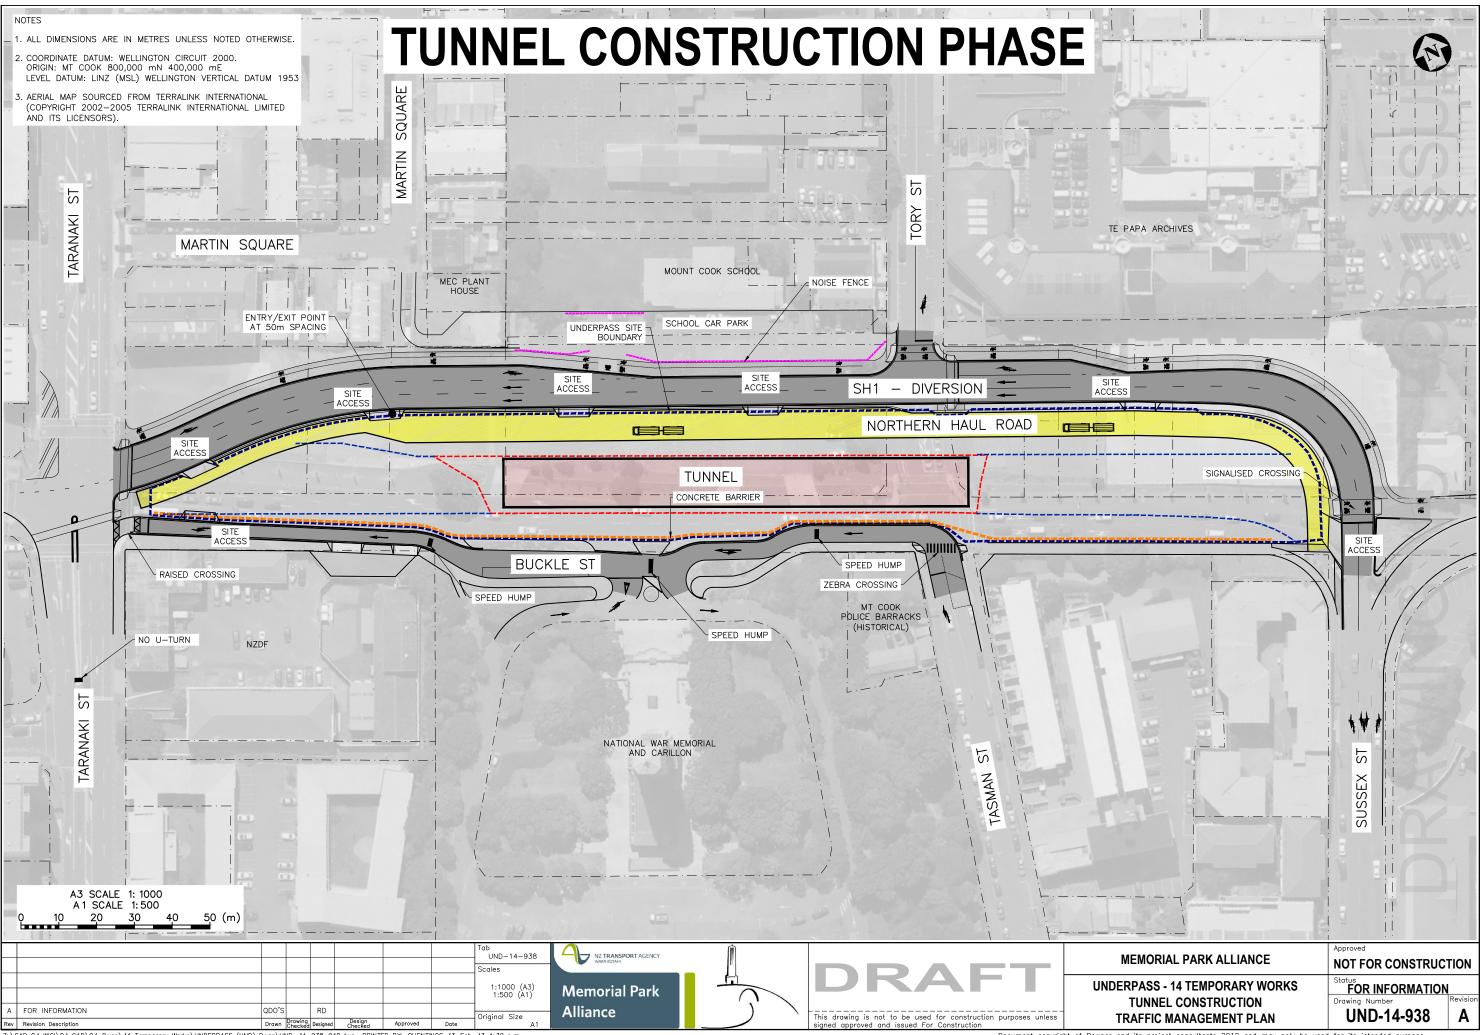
to 940 shows the indicative site layout relative to the SH1 diversion road, and examples of how construction vehicles will typically access the site for various phases of construction. Construction is to start at the Taranaki Street end, with excavation and construction of temporary retaining walls progressing east, followed by construction of the concrete floor, walls, then roof of the tunnel following behind.
